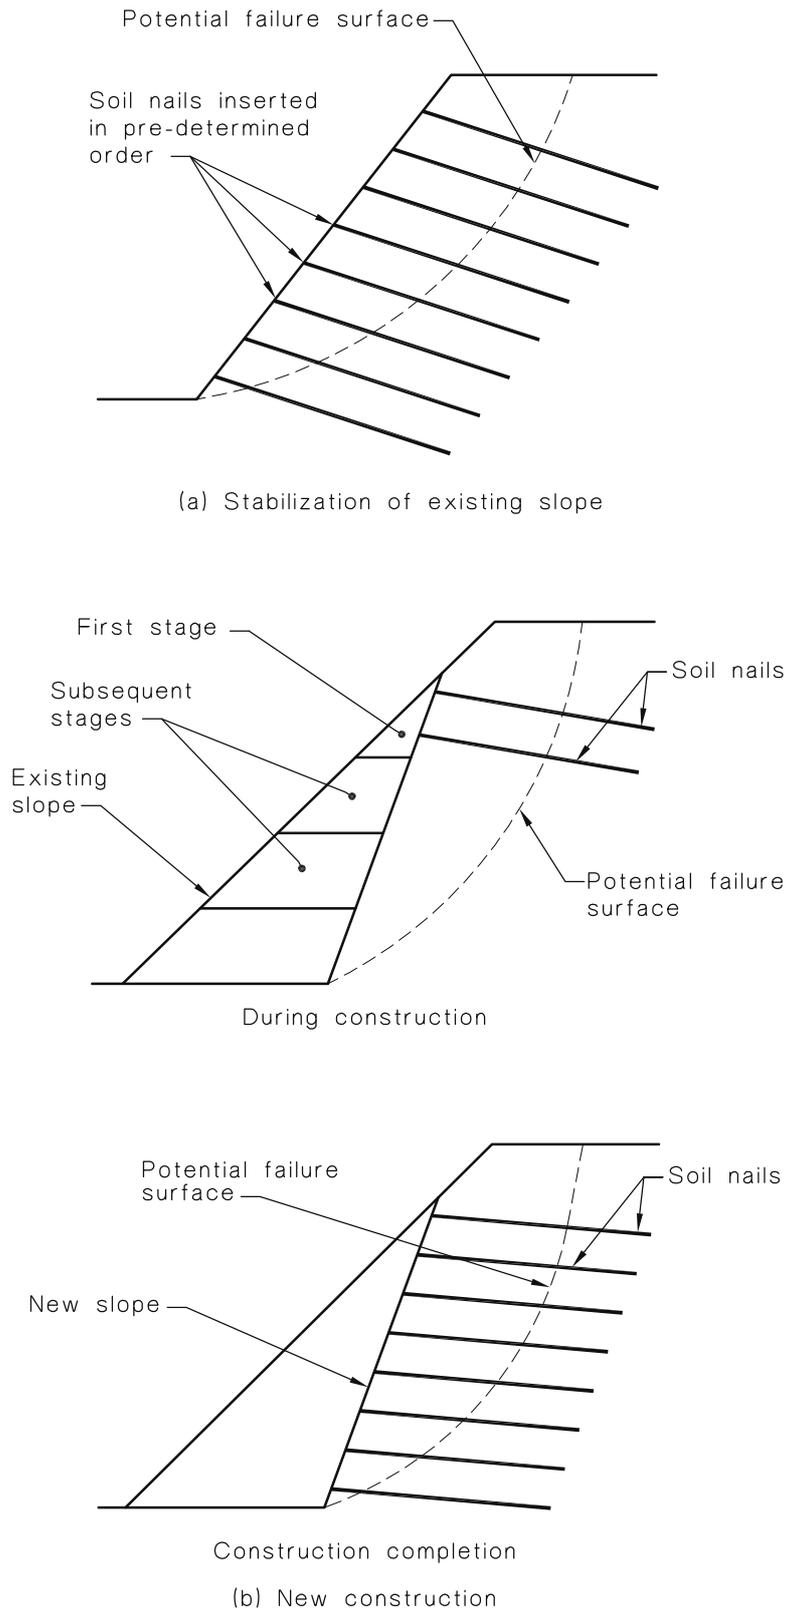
APPLICATIONS OF SOIL-NAILING
